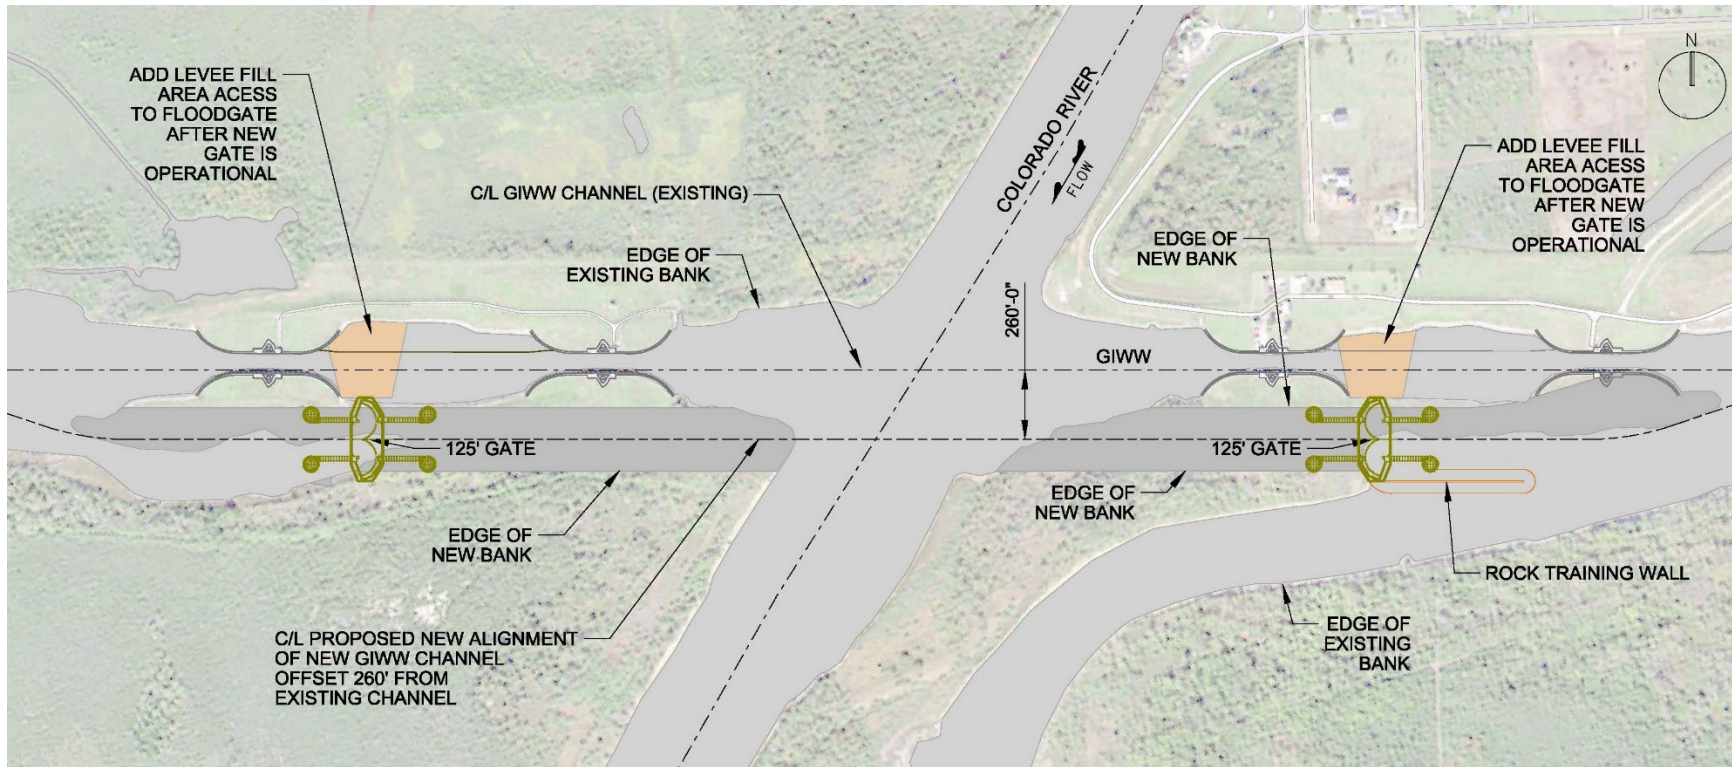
CRL Component of the Recommended Plan – [Refined Alternative 4b.1]
